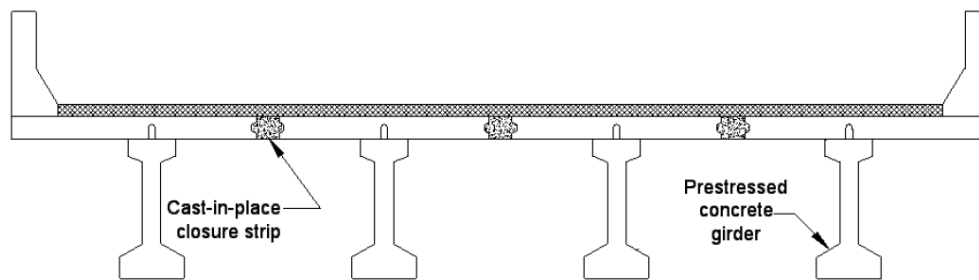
Prefabricated bridge superstructure made of bulb-tee girders
